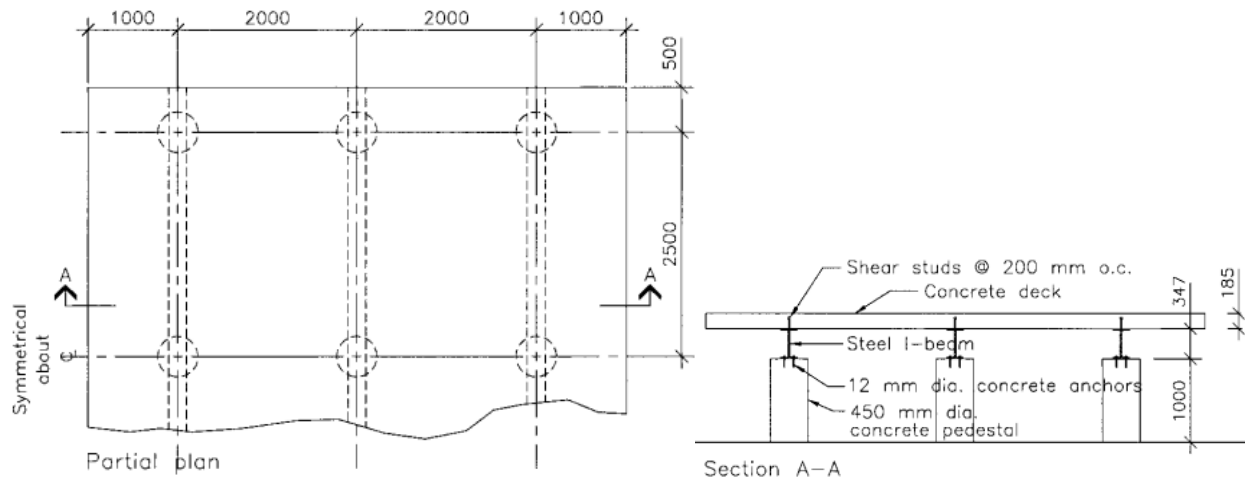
Plan and cross section of tested bridge-deck (Rahman et al. 2000)
